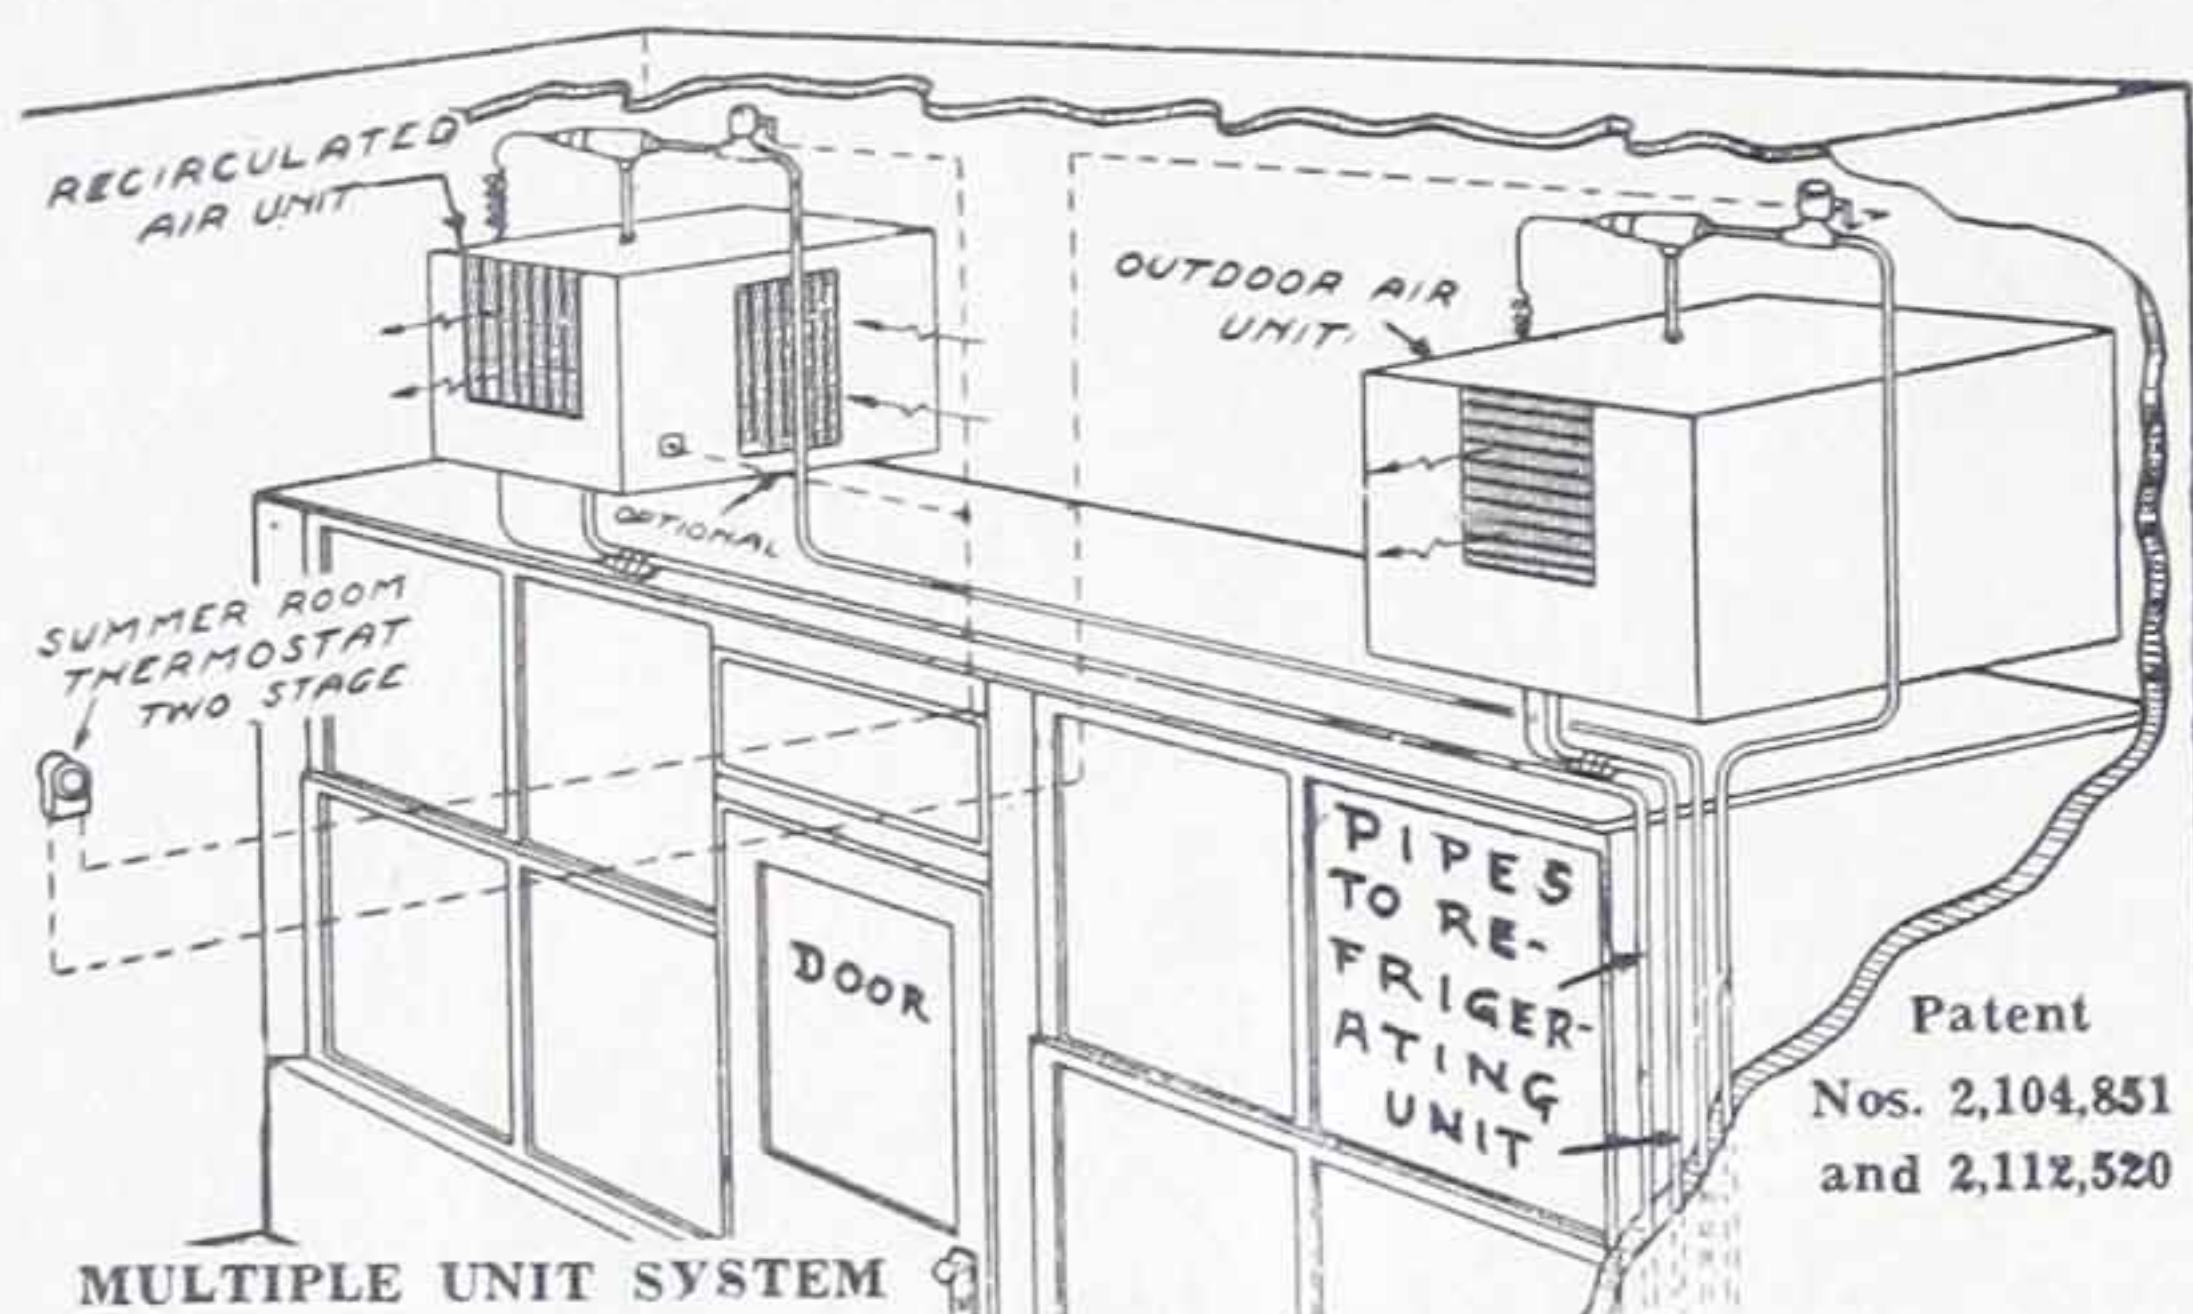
Patented System Using One Machine and Two or More Unit Coolers.
